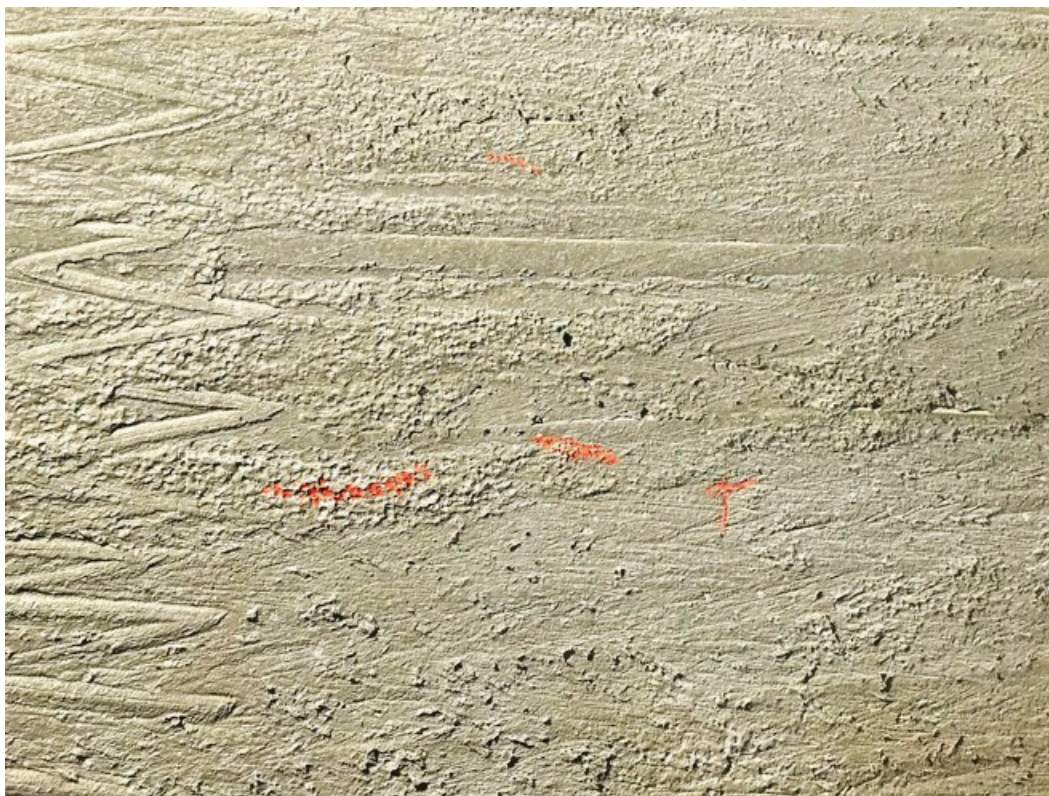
Spalling on parent slab in the trafficking area at 224 passes.
